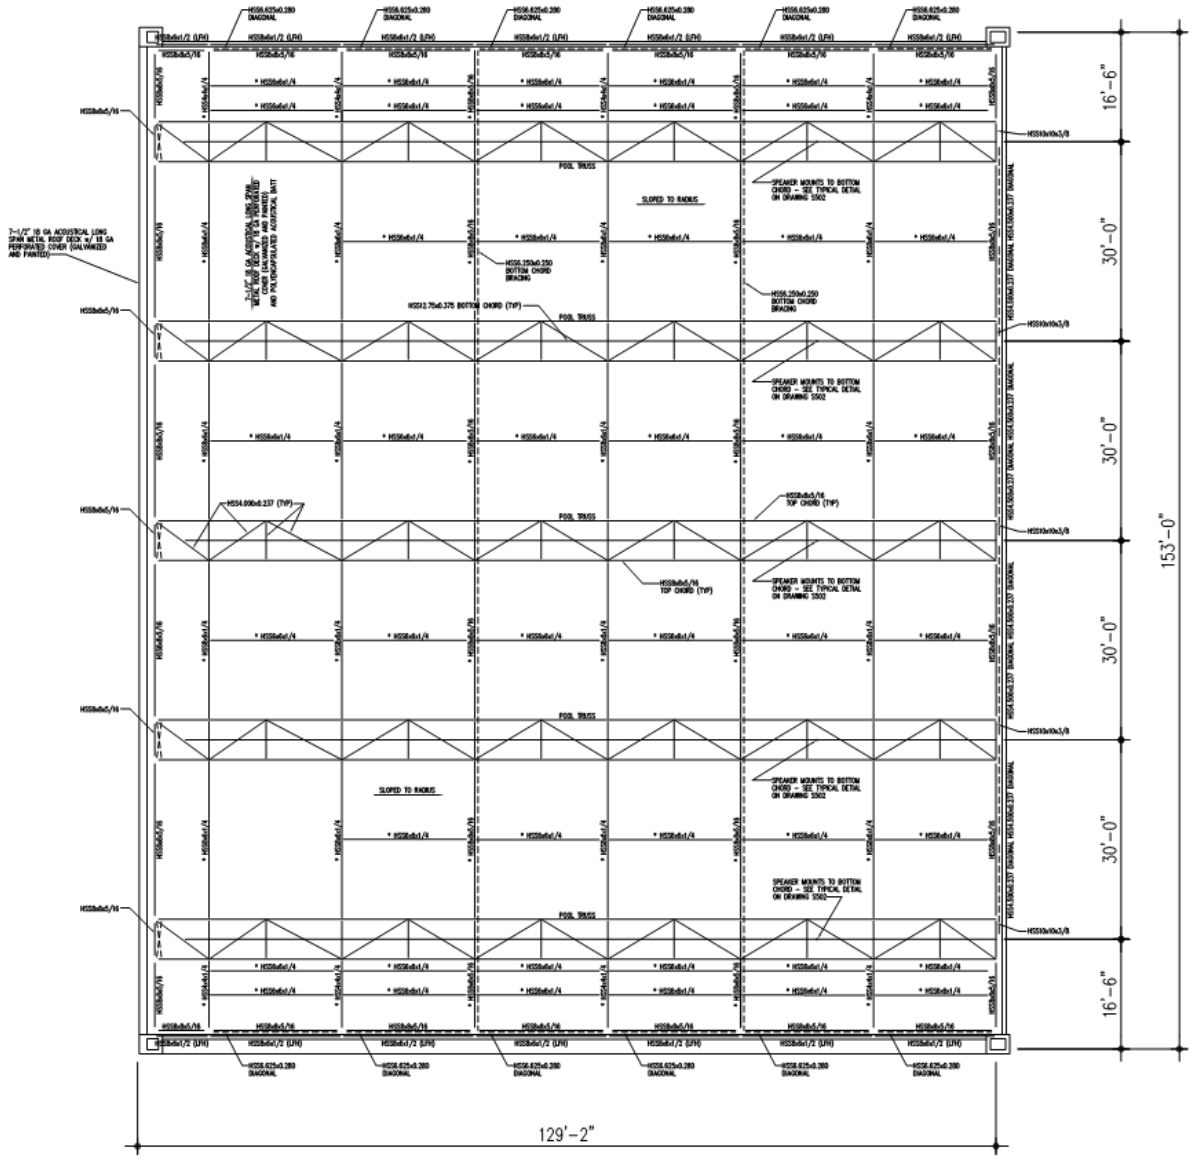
Roof Framing Plan (including the five large trusses above the pool area spaced 30'-0" on center and additional framing)
